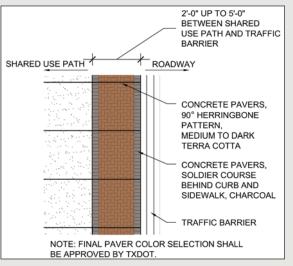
Shared Use Path Roadway Buffer, 2 Feet to 5 Feet, from Traffic Barrier
